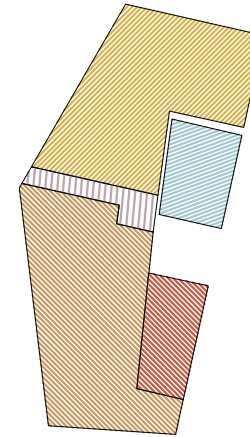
The split level dwelling has interesting spaces due to the sloping walls and ceilings (c) BBK-3 (BBK-3 2022)
